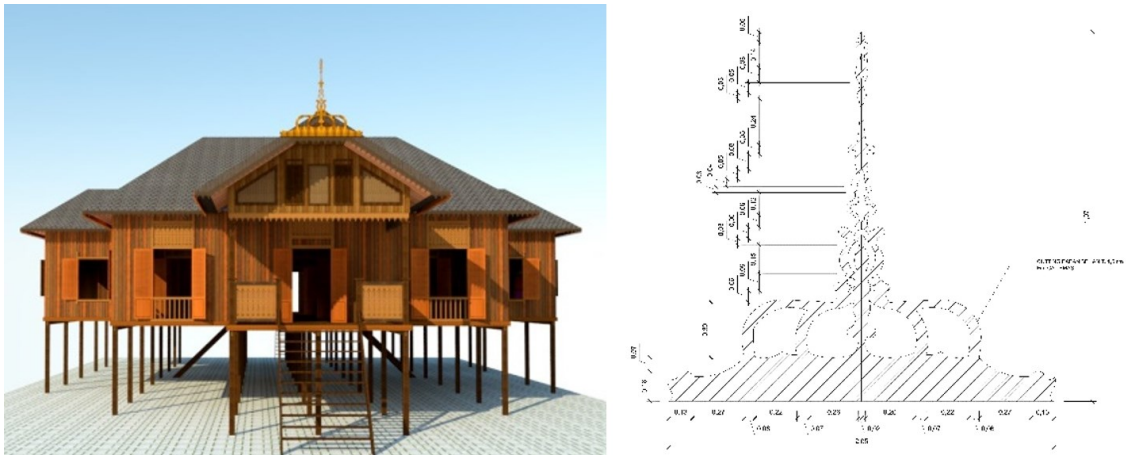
Front Façade and Architectural Details of Finials in the Hajjah Salmah House
